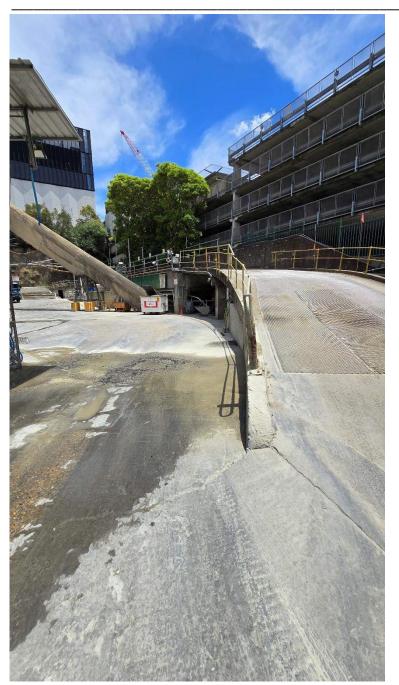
Cracks observed (40, 41, 42, 43, 44) - Concrete cracks throughout area
